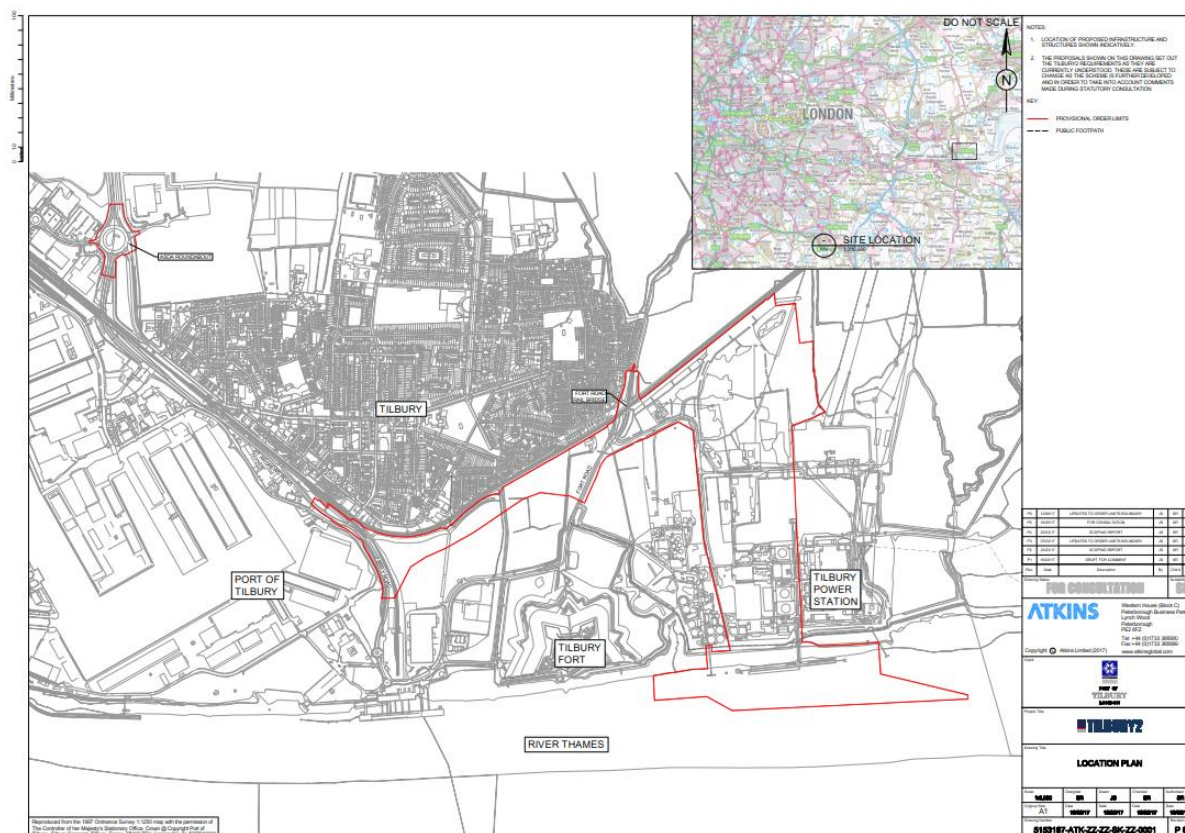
Proposed Development area showing the Tilbury2 Site and Infrastructure Corridor
